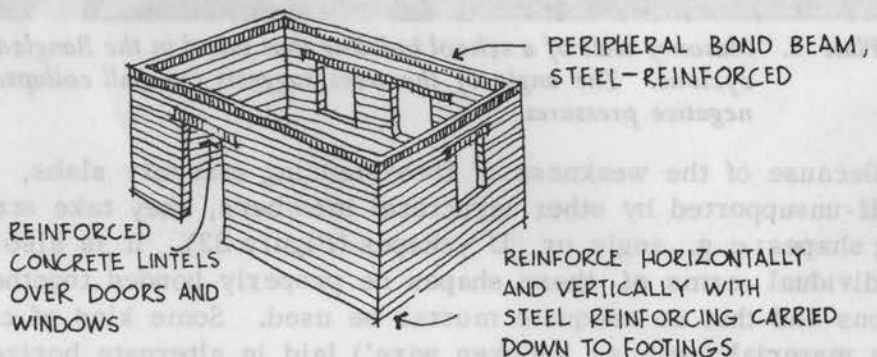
STRENGTHENING LOAD-BEARING CONCRETE MASONRY
